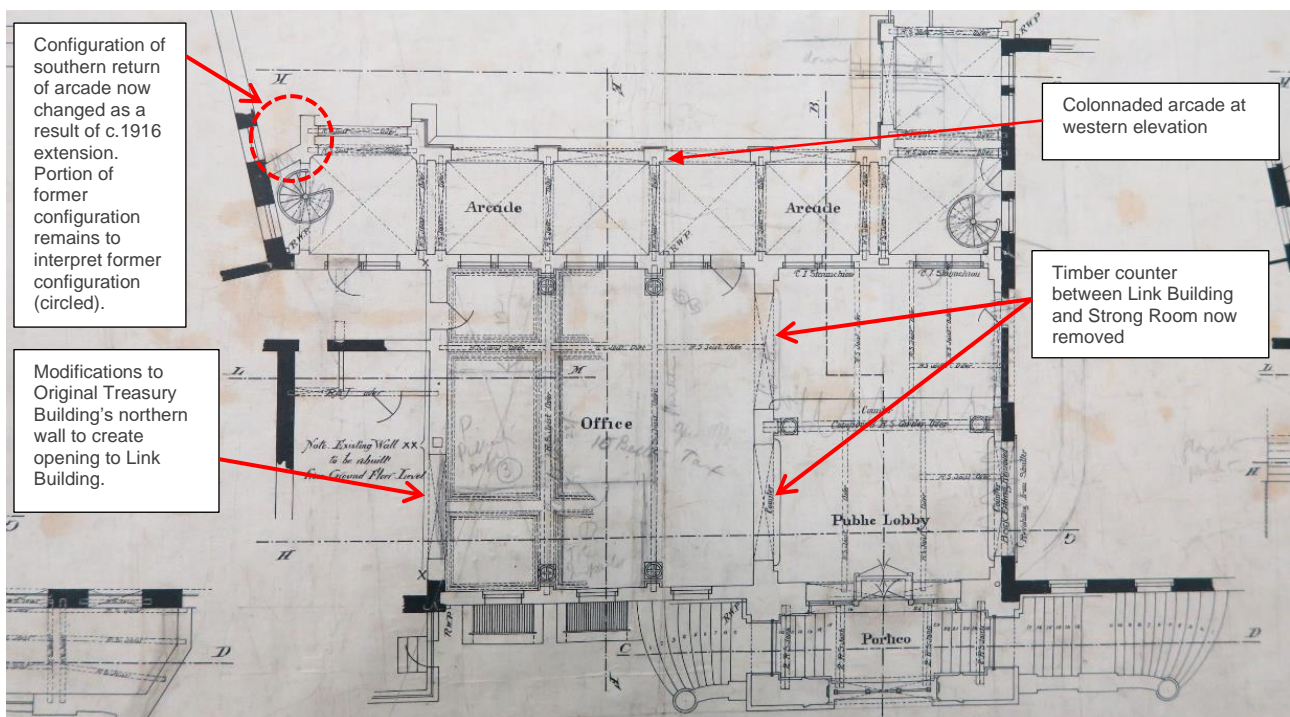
Ground Floor Plan, by Vernon, December 1897
